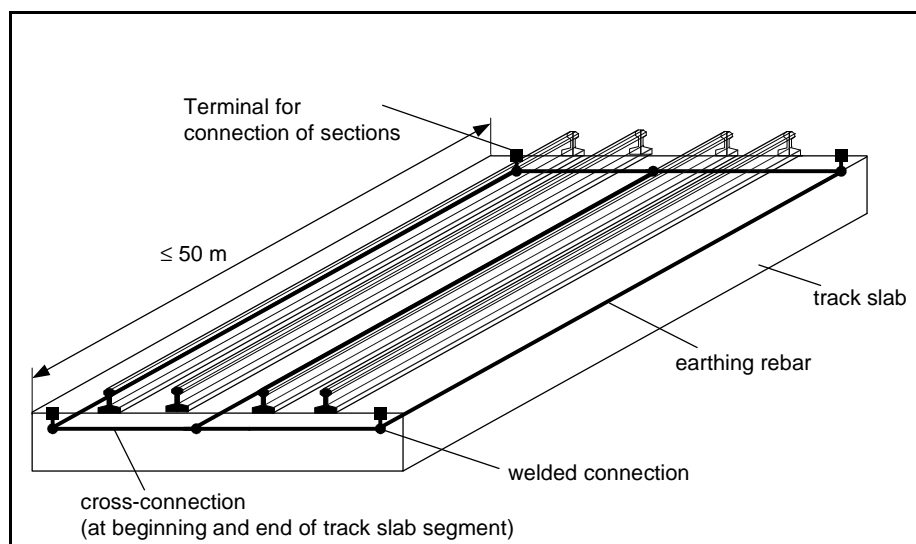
Example of Earthing Connections in Unballasted Paved (Slab) Track
